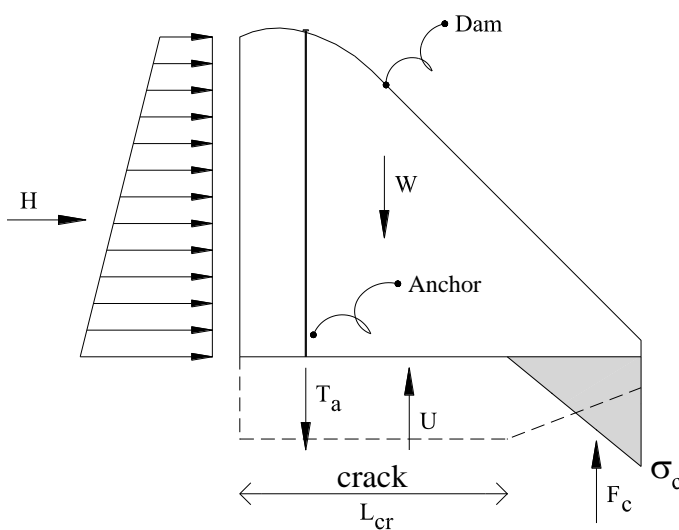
Gravity dam with passive anchor (H – Hydrostatic load, W – Weight, T_a – Tensile force, U – Uplift force, σ_c – Concrete stress, F_c – Concrete force, L_{cr} – Crack length)
